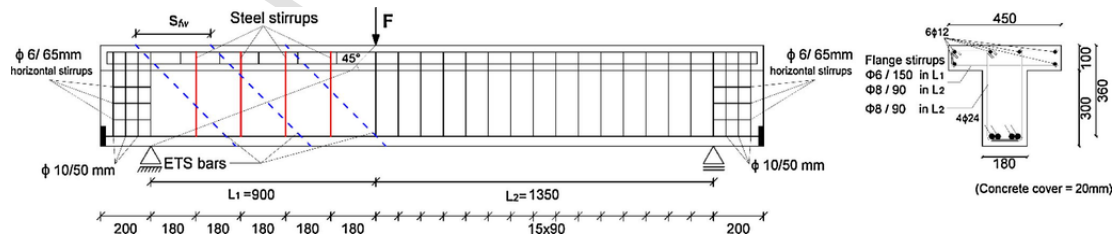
Tested beams: geometry, steel reinforcements applied in all beams. Beam 4S-S300-45 is presented: stirrups spaced at 180 mm and inclined ETS bars spaced at 300 mm (all dimensions in mm).
